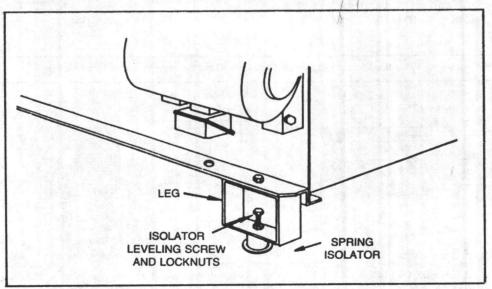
Attaching the Mounting Leg and Spring Isolator to the High Pressure Sprayed Coil Unit
